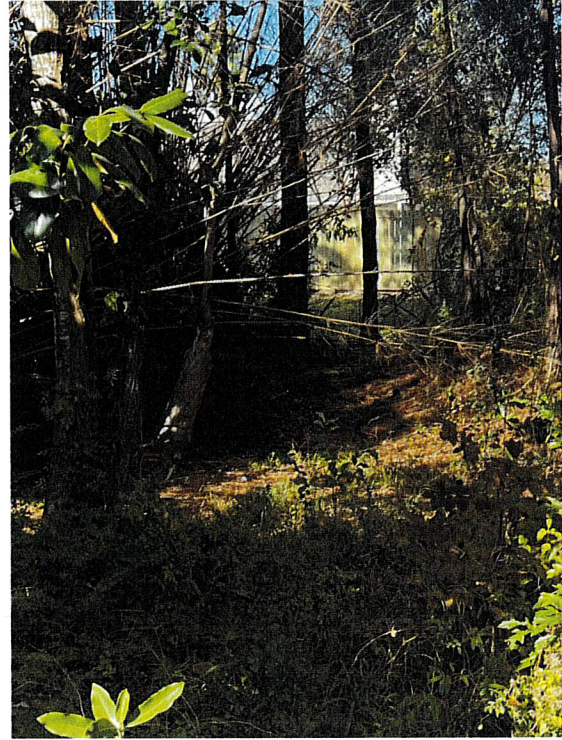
The same water barrier between the southernmost drainage ditch of the Beverly Place subdivision and the north side of 3305 and 3307 Government Street; the picture shows a typical day; photo taken on Friday, November 14, 2025 at 1:36pm.
